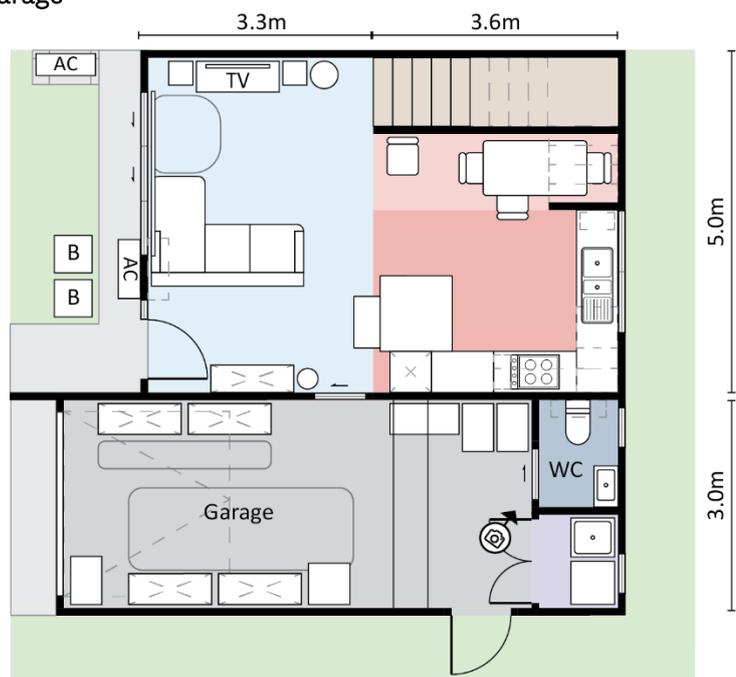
Ground floor WC separated from kitchen, dining and lounge by additional door, accessed through laundry
